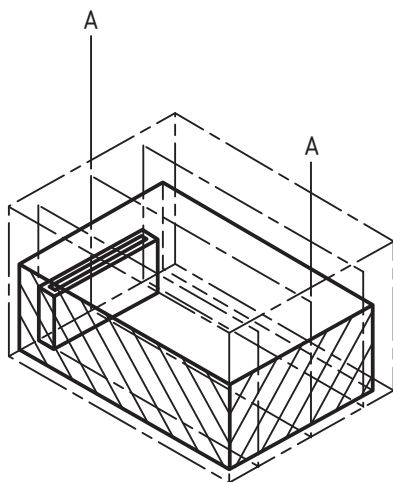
Diffuser (or fan coil) in window or floor position – example of test planes
